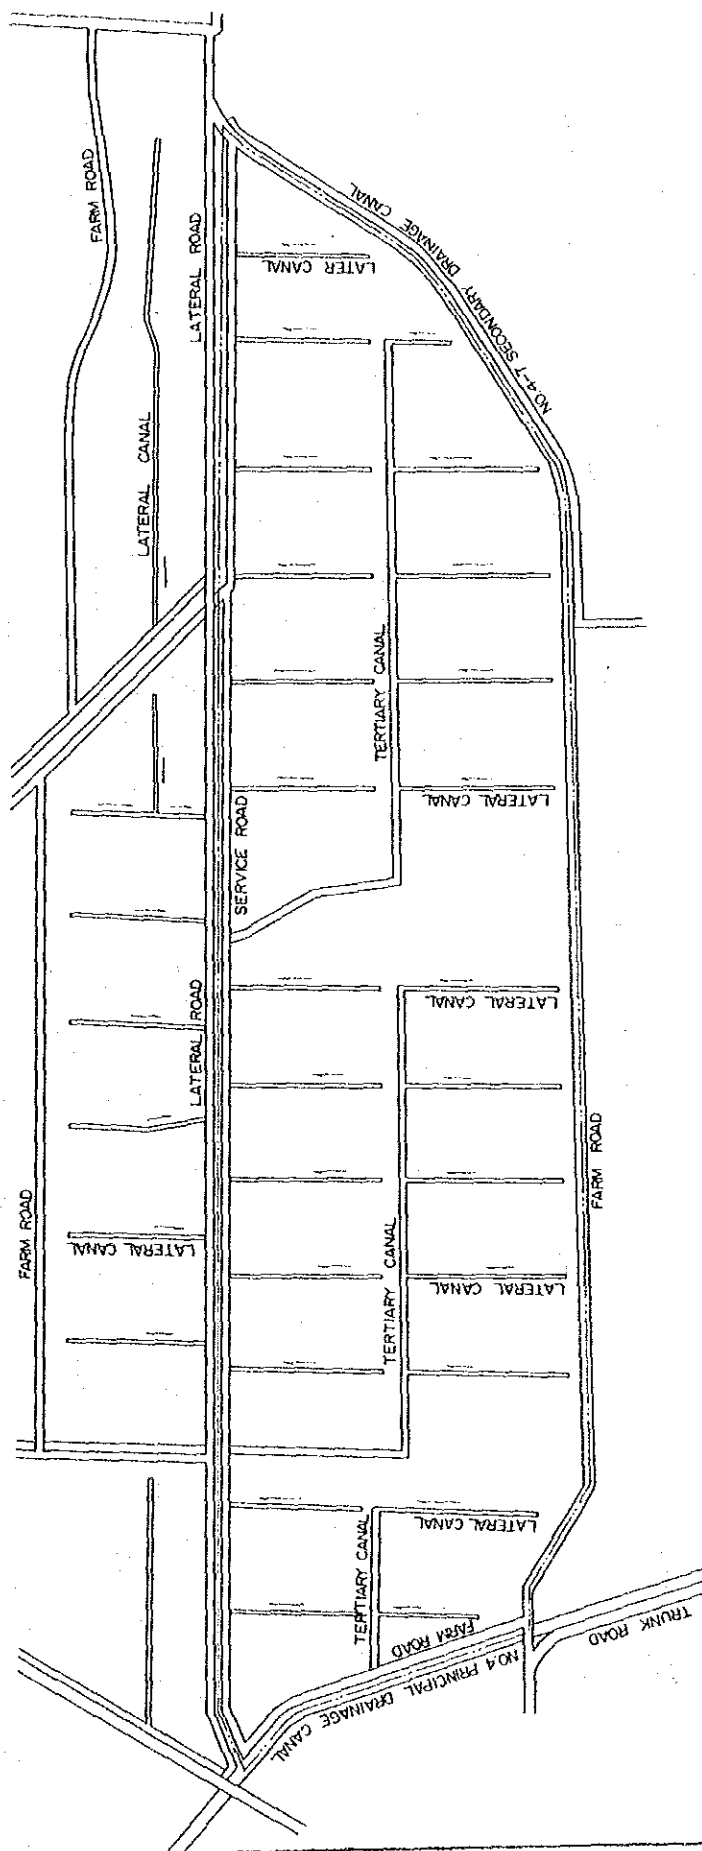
(2) Land Consolidation Plan - Bataan Norte Area
